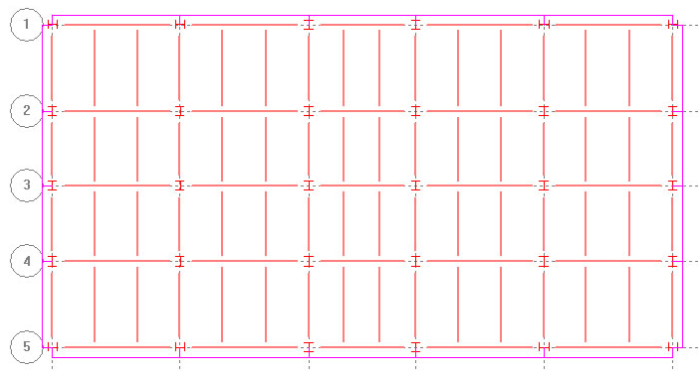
B. Existing Composite Steel Layout, Floors 2-4
